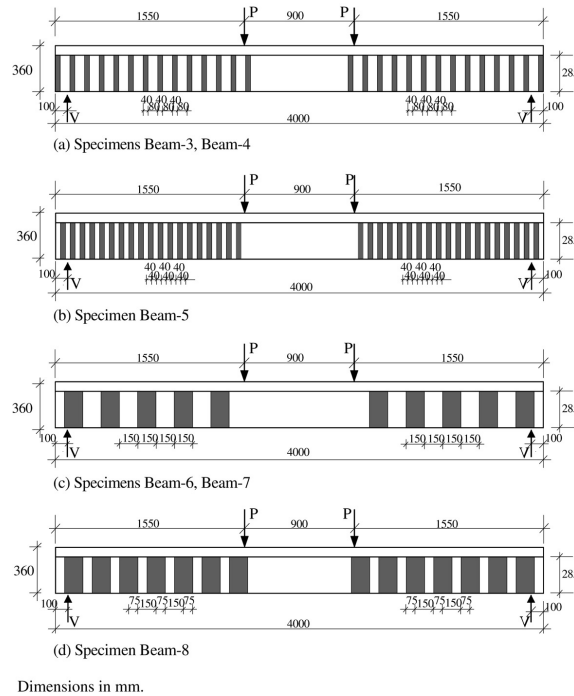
16- Reinforcement details of specimens (Altin et al. 2005).
